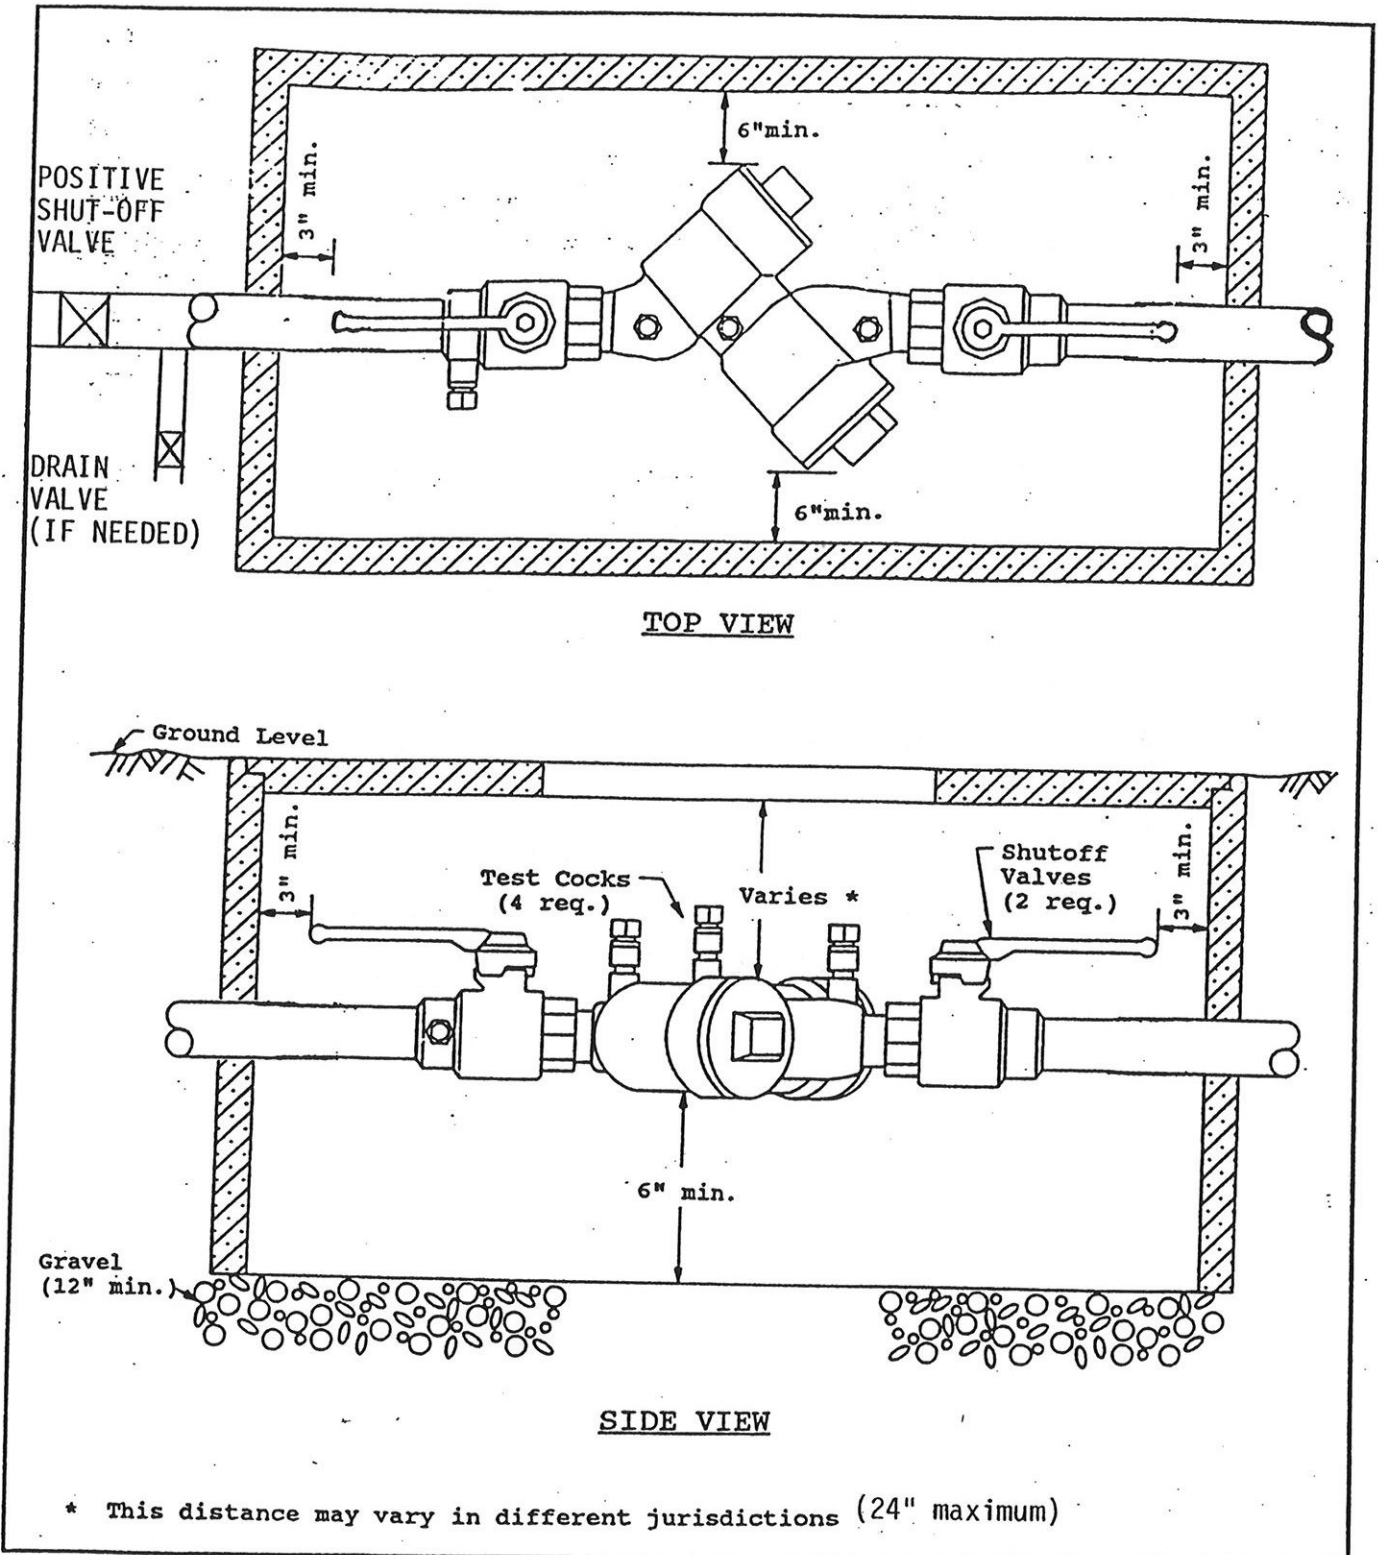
Minimum Clearances For Small Size DCVA In Below-Ground Box.
